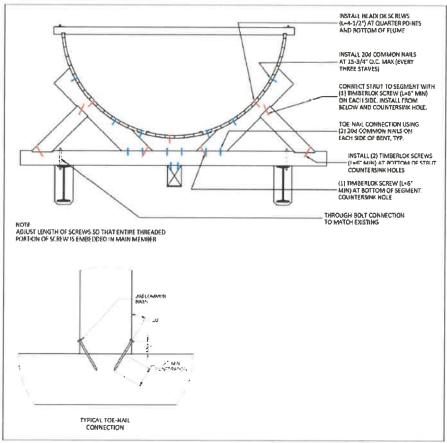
Recommended fastener pattern to be used for the Flume reassembly.
